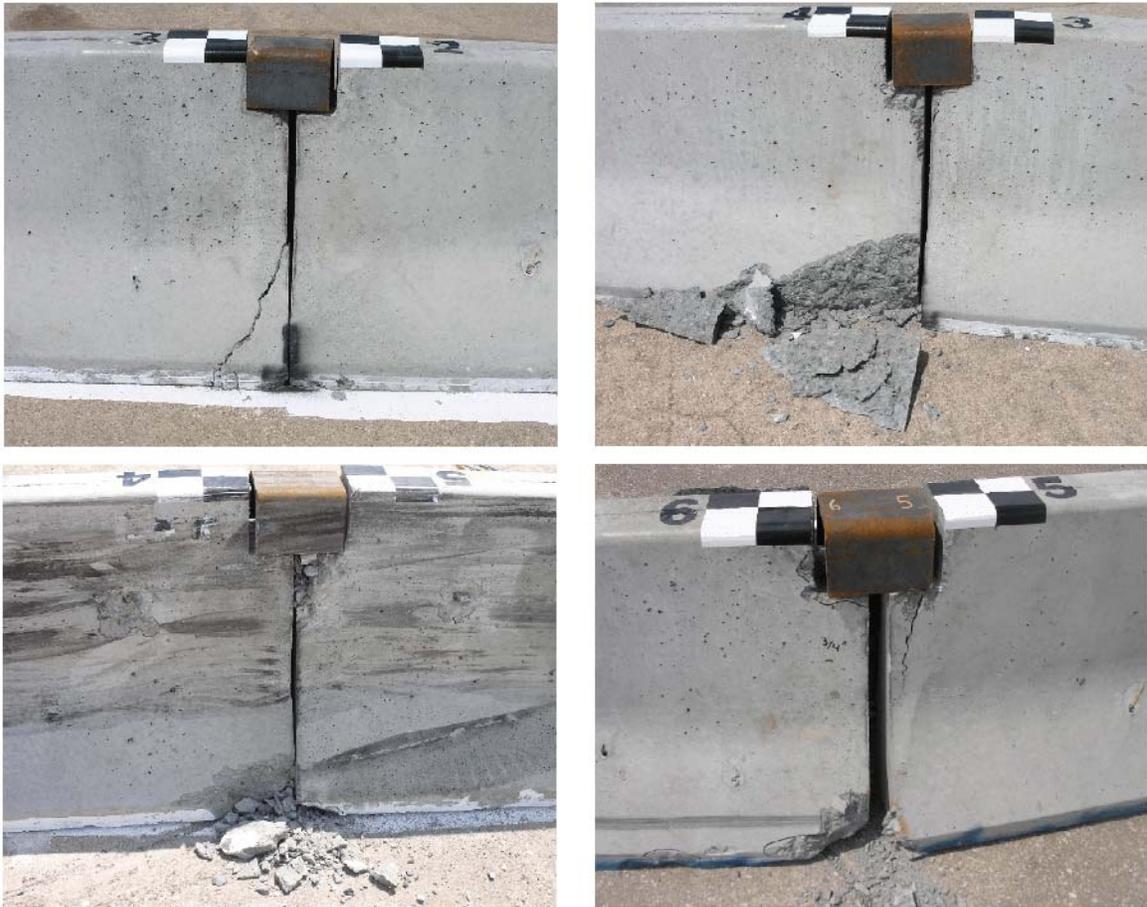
Joint Connection Damage - Joints 2-3, 3-4, 4-5, and 5-6, Test NYTCB-1
